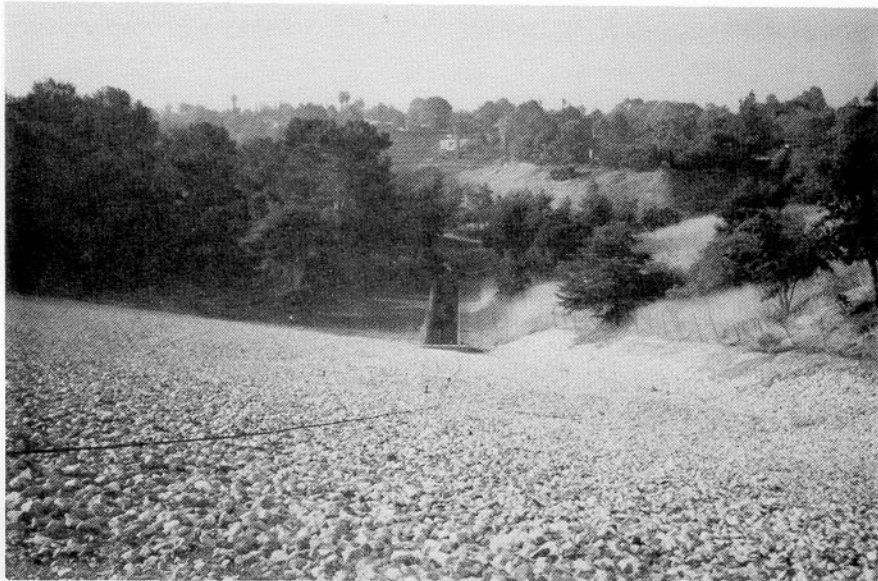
Downstream slope of dam, with outlet channel in background (view toward south).
